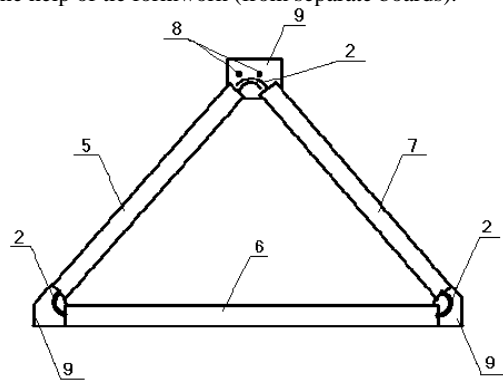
Section of a prefabricated monolith reinforced concrete beam of hollow triangular shape
